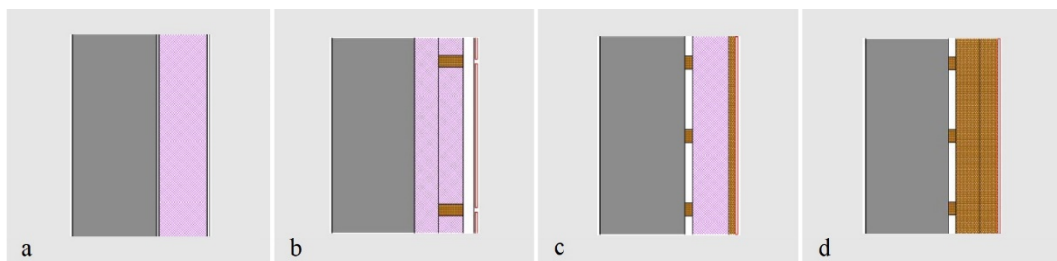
Solutions of refurbishment façades for existing buildings envelope: a) ETICS, b) Ventilated façade system, c) Partly prefabricated façade system and d) Prefabricated module system [8]
